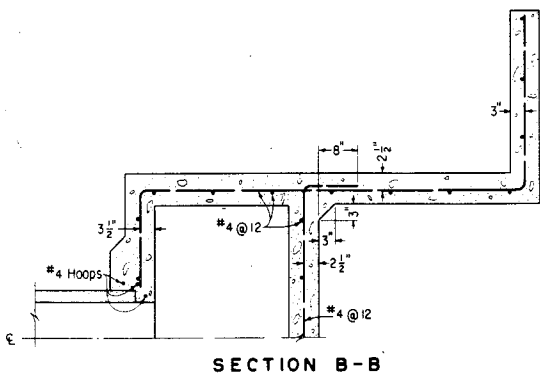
Type 2 baffled outlet. 103-D-1341
